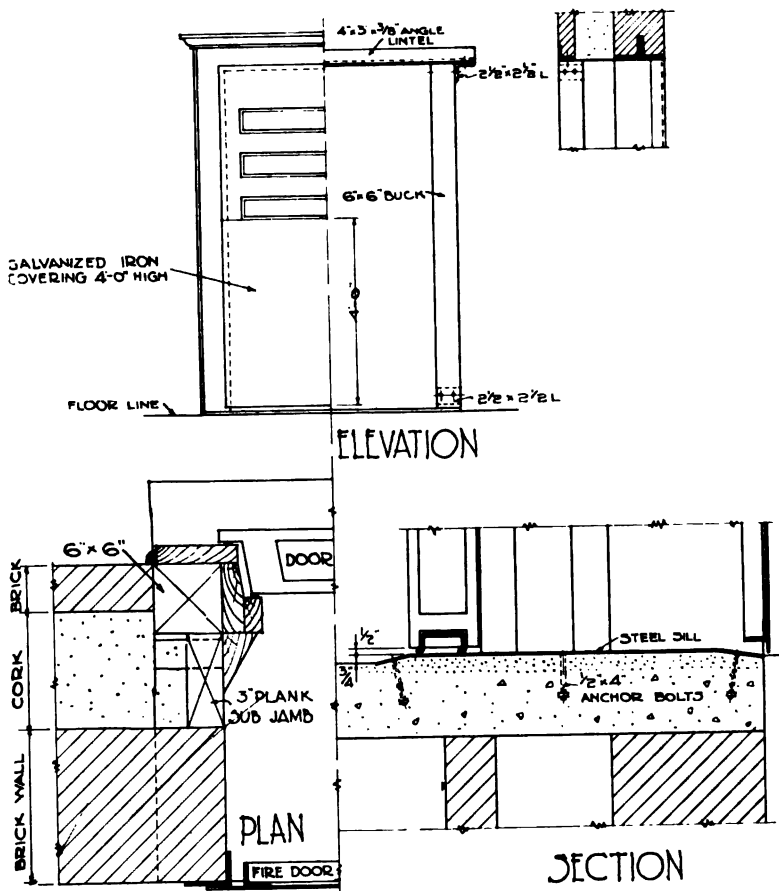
REFRIGERATOR DOOR IN DOUBLE WALL INSULATION.
